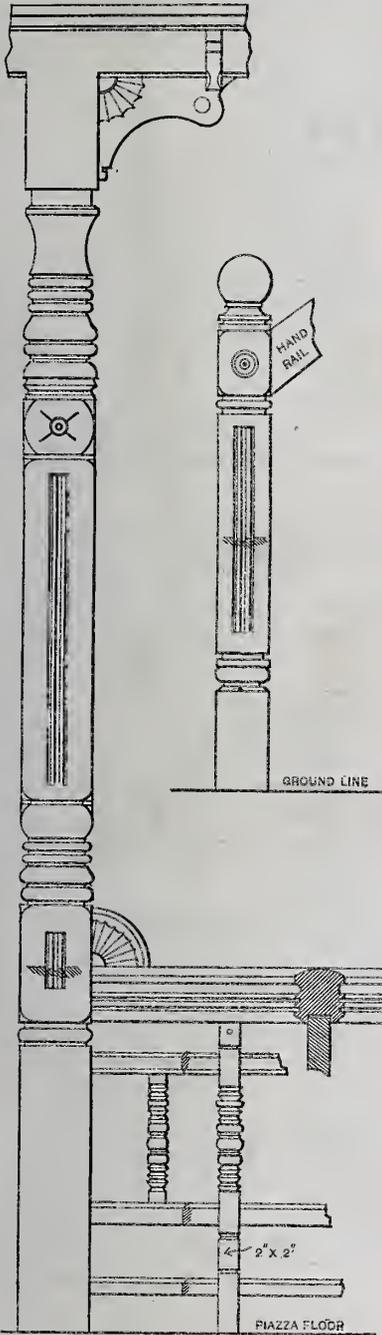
Details of Piazza.—Scale, 1/2 Inch to the Foot.
